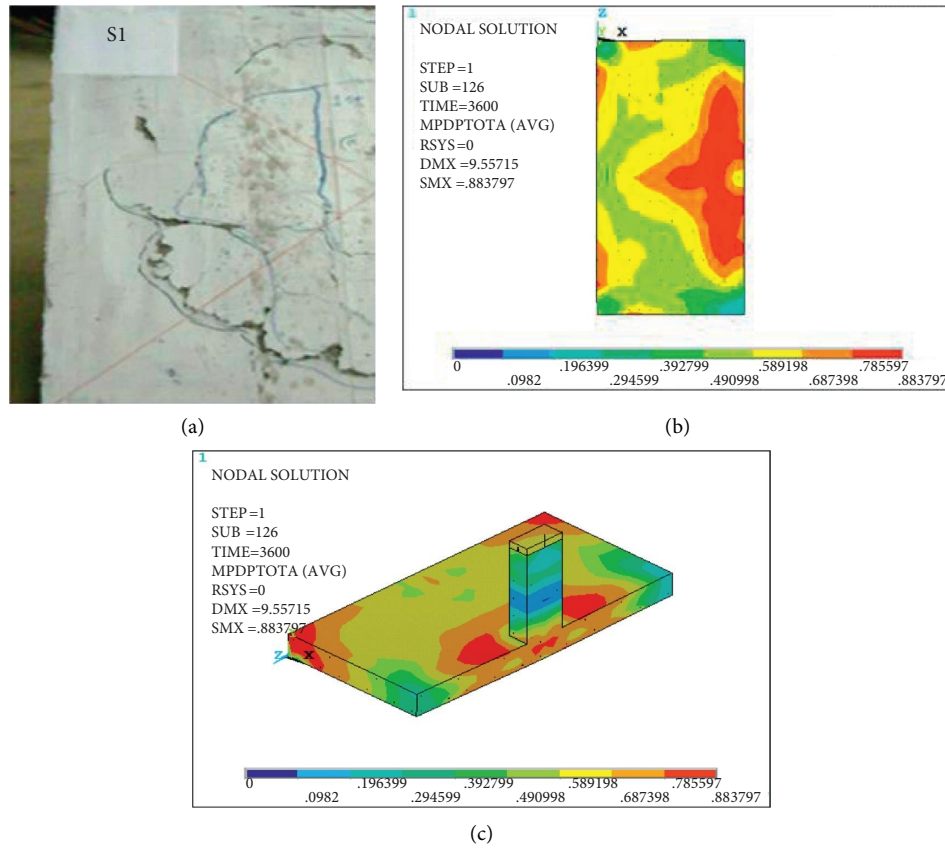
Comparison of concrete damage of specimen S1 due to 3600 sec fire exposure and maximum load. (a) Experimental half-scale [11]. (b) FEA half-scale plan view. (c) FEA half-scale 3D view.
